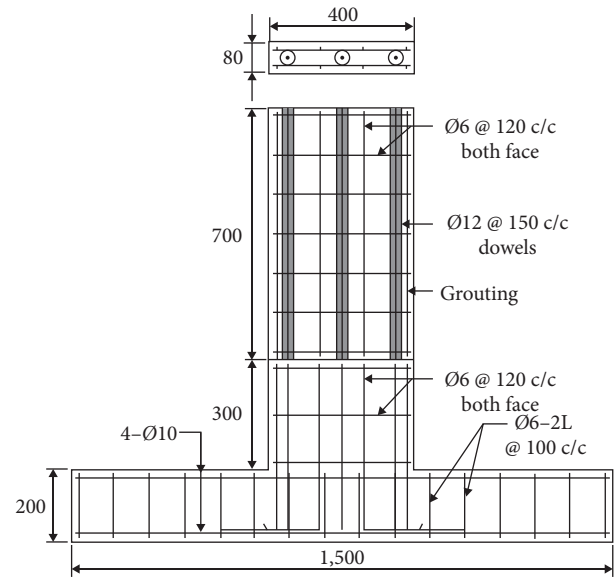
Precast wall panel—slender 1 (PWS1).
